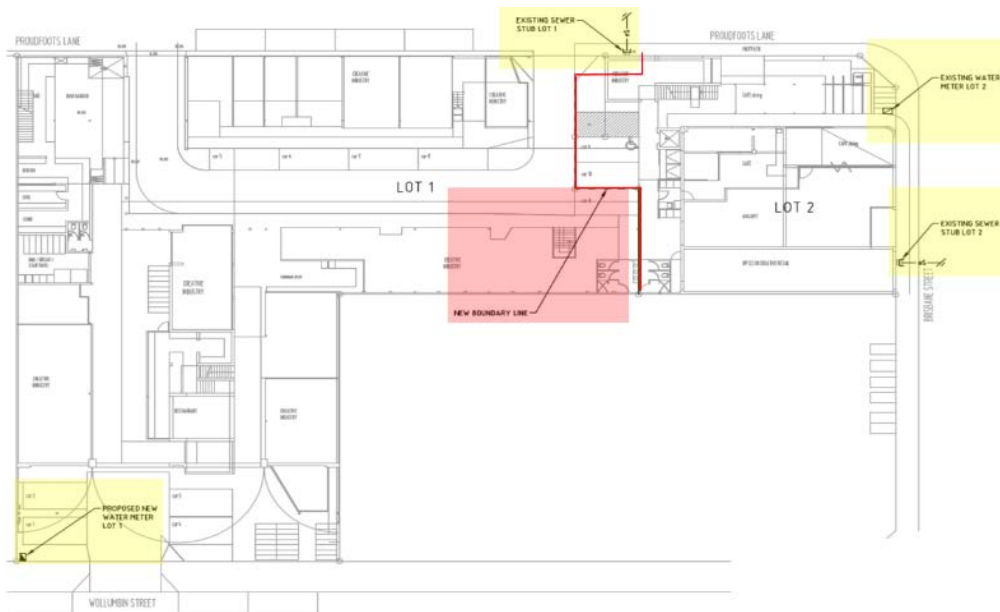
Extract of proposed plan highlighting service provisions and proposed new boundary
